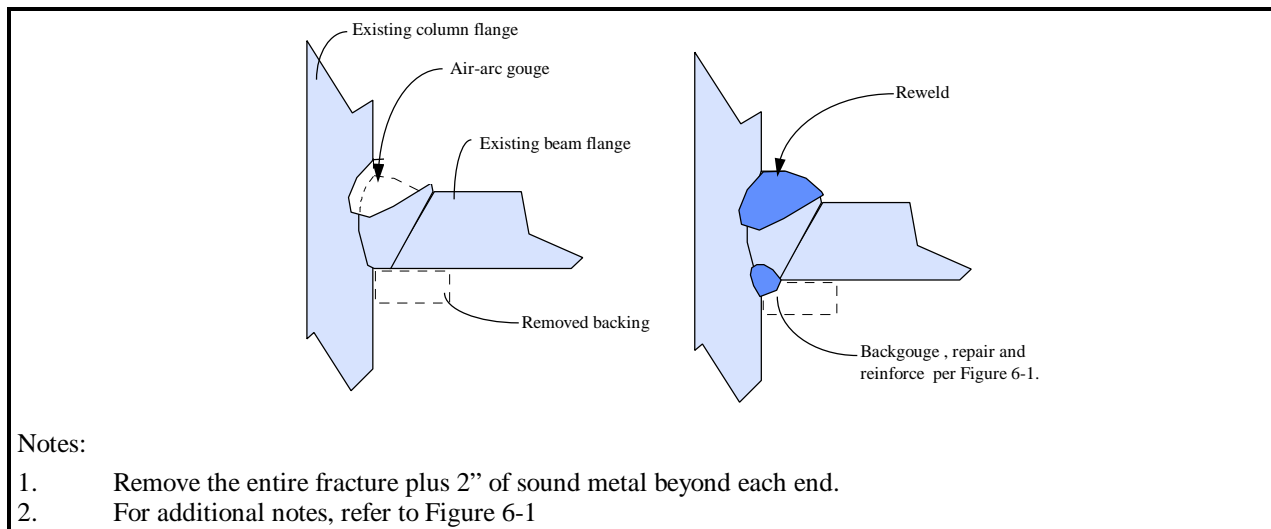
Gouge & Re-weld of Fractured Weld - W1
